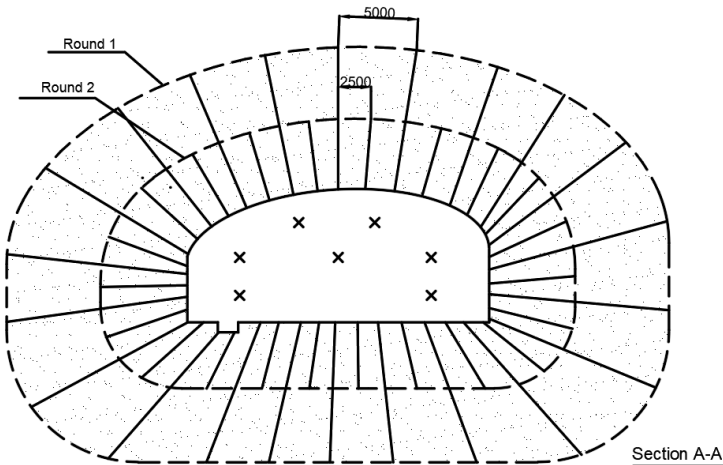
Cross section of the grouting procedure in the main tunnels (perpendicular to the tunnel direction)
